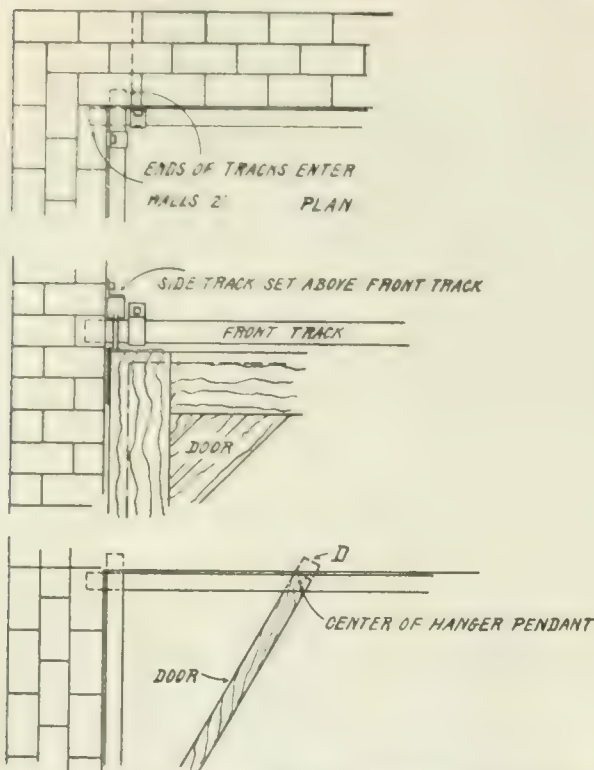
Details of Track and Hangers arrangement for Right Angle Sliding Doors.
